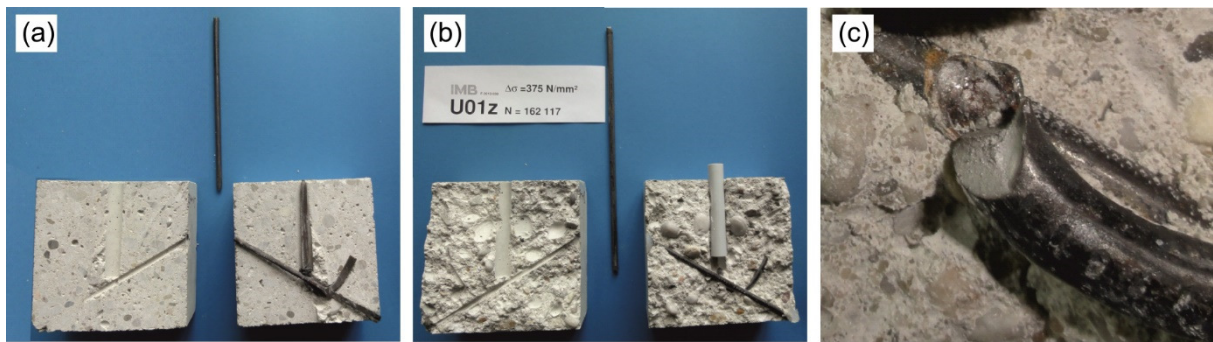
Fracture pattern of small size specimen under monotonic loading (a), cyclic loading (b) and fatigue fracture of welded node (c)
